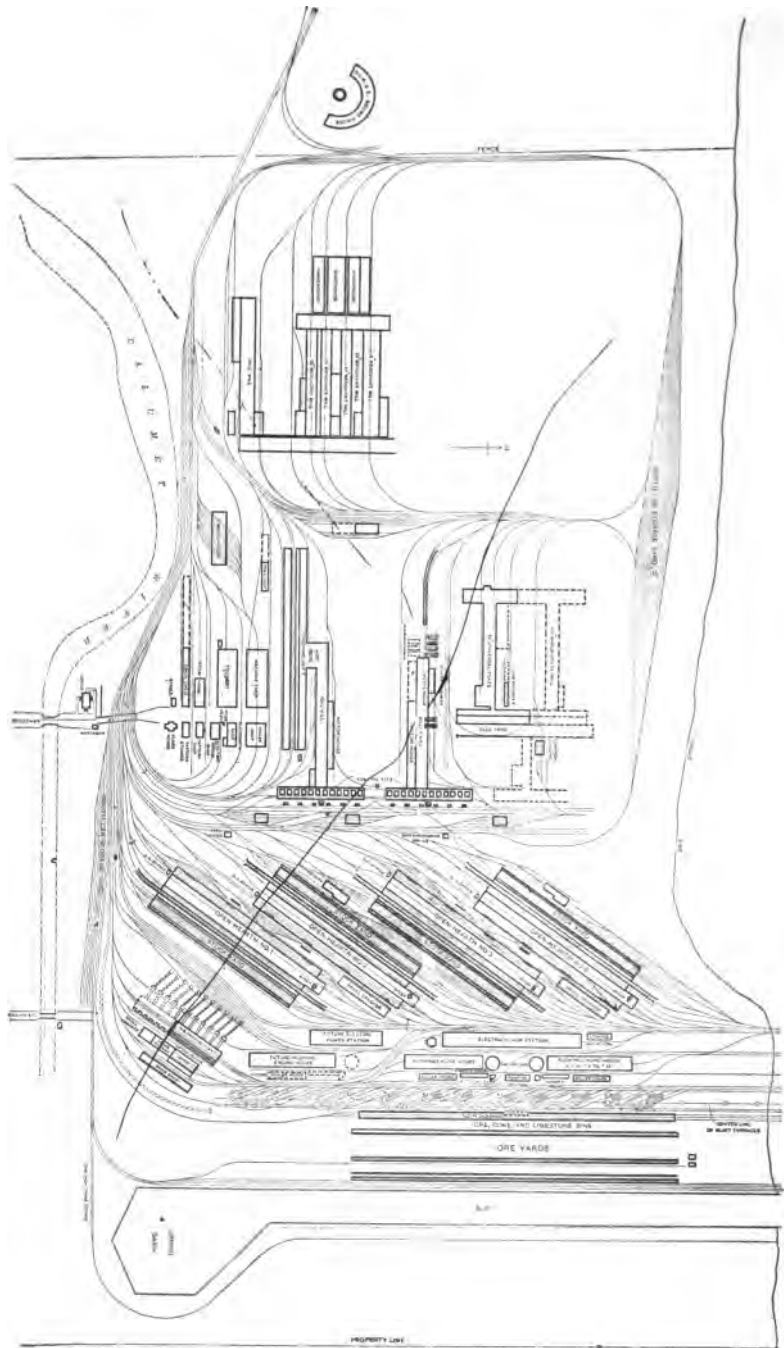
GENERAL GROUND PLAN AND TRACK LAYOUT FOR THE PLANT OF THE INDIANA STEEL CO. AT GARY, IND.
